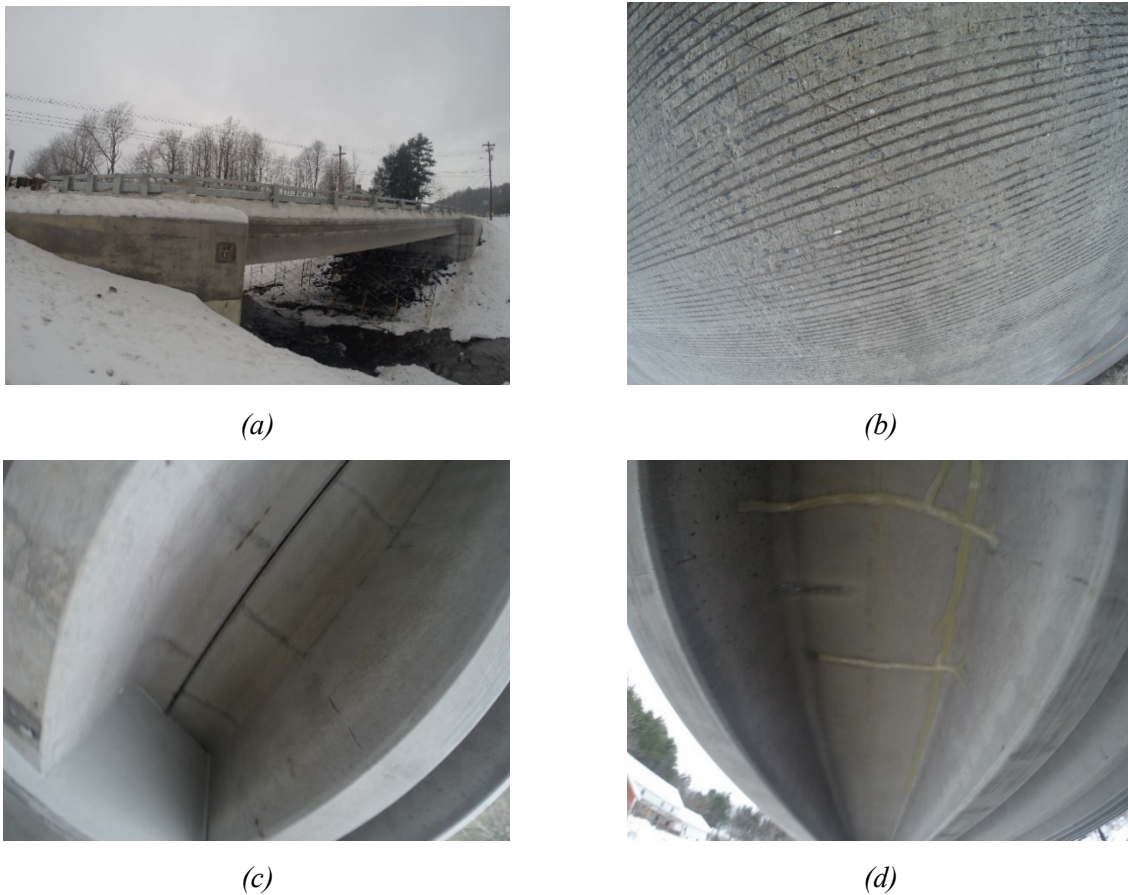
VT 100 Gold Creek Bridge near Moscow and Stowe with girder and deck cracks (a) bridge side view, (b) deck with multiple cracks, (c) girder with cracks in the flanges near to the end, and (d) some of the cracks repaired
